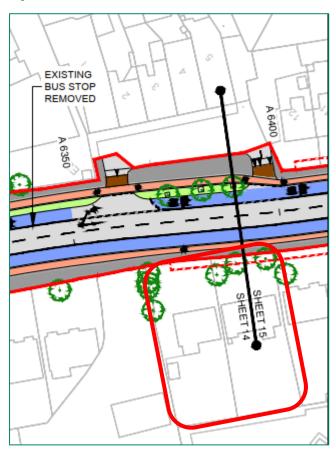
Proposed new Layout at Northern section of Mornington Park, Malahide Road
